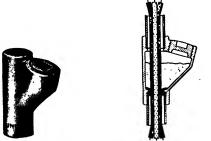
Conduit Sealing Fitting and Cross Section Showing Wires Sealed in the Conduit
